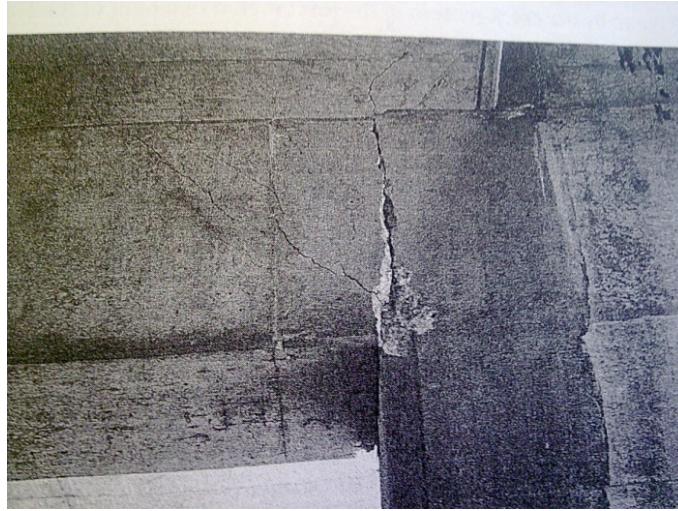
Cap beam positive moment cracks at inner column face, 1989 Loma Prieta earthquake (Adapted from Priestley et al. 1996).
